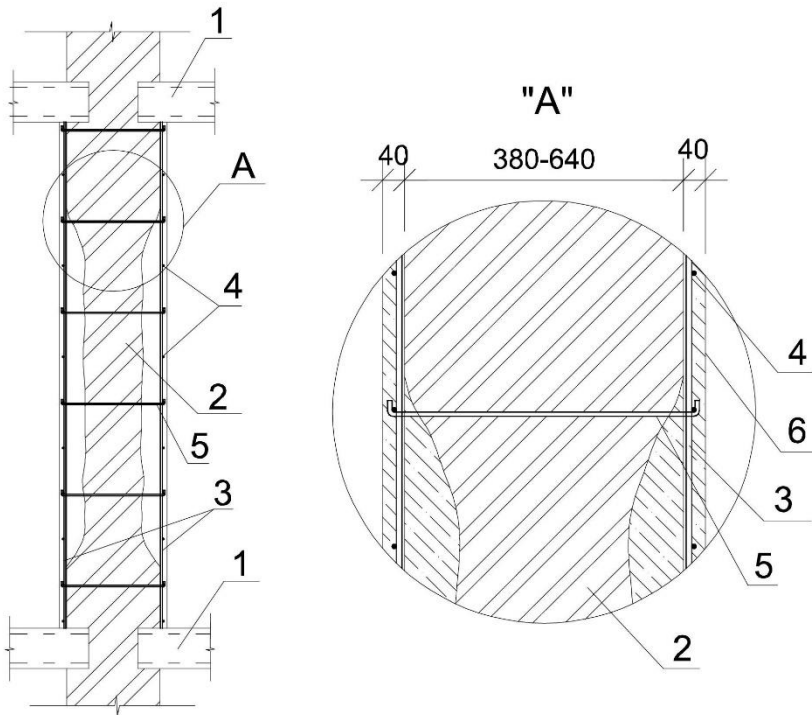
Restoration of the masonry by installing a shotcrete jacket: 1 – floor; 2 – brick masonry; 3 – vertical rods of reinforcing mesh (diameter 10 mm, spacing 250 mm, reinforcement class A400C); 4 – horizontal rods of reinforcing mesh (diameter 8 mm, spacing 250 mm, reinforcement class A400C); 5 – reinforcement clamps (diameter 8 mm, spacing 500 x 500 mm, reinforcement class A240); 6 – shotcrete (strength M250 (C20/25))
